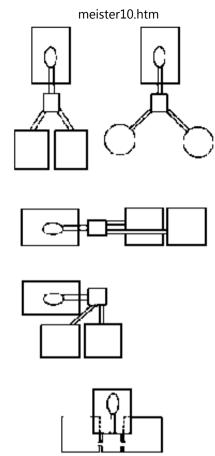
Some layout options for double-pit offset pour-flush latrines
